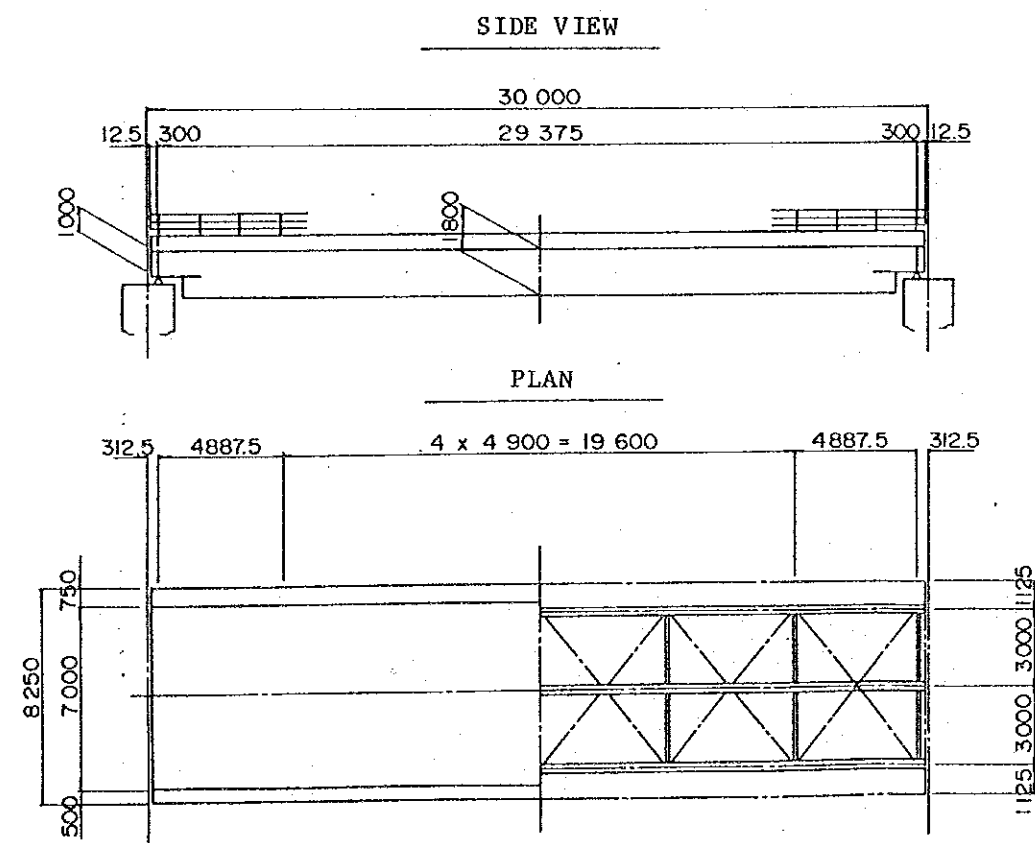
GENERAL PLANS OF SUPERSTRUCTURE
